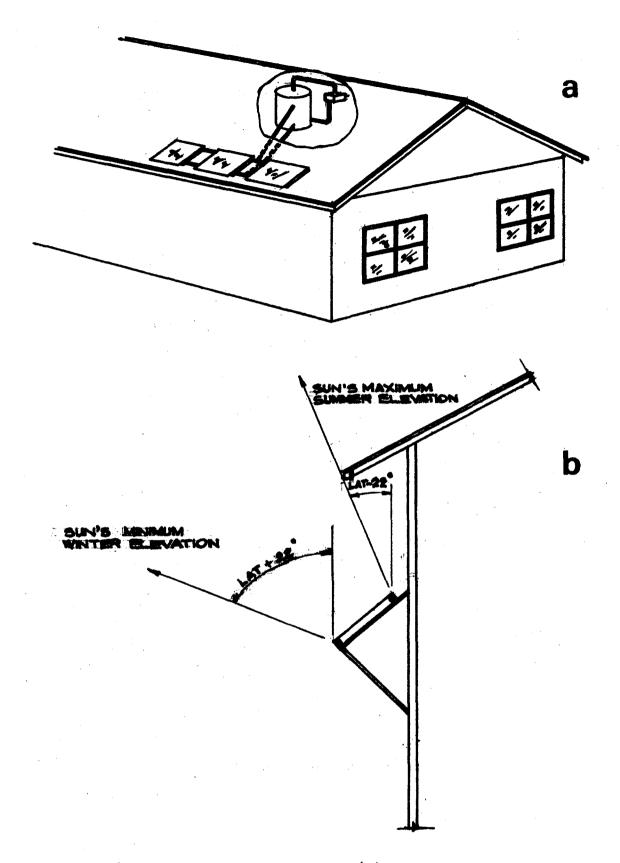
Absorbers roof mounted. (a) Absorbers roof mounted tank in roof. (b) Shaded geometry for solar absorbers.
